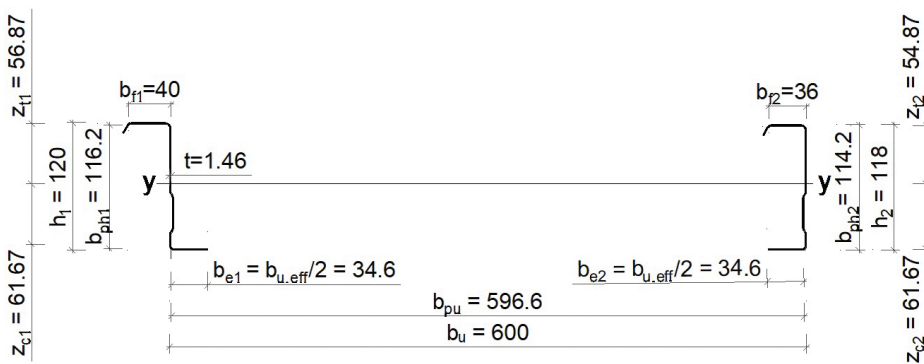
Effective cross section of the wide flange under compression and the entire cross sections of the webs of a 600/120 wall cassette
